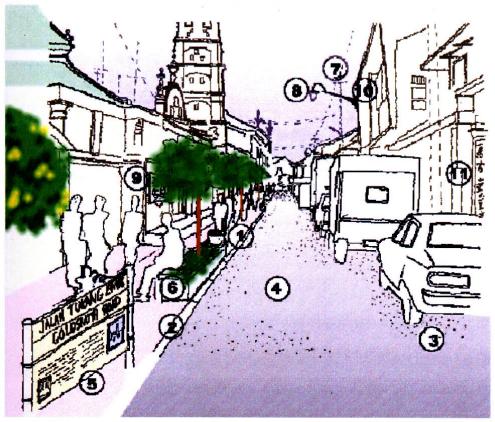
Proposed streetscape improvements to Jalan Tukang Emas.
